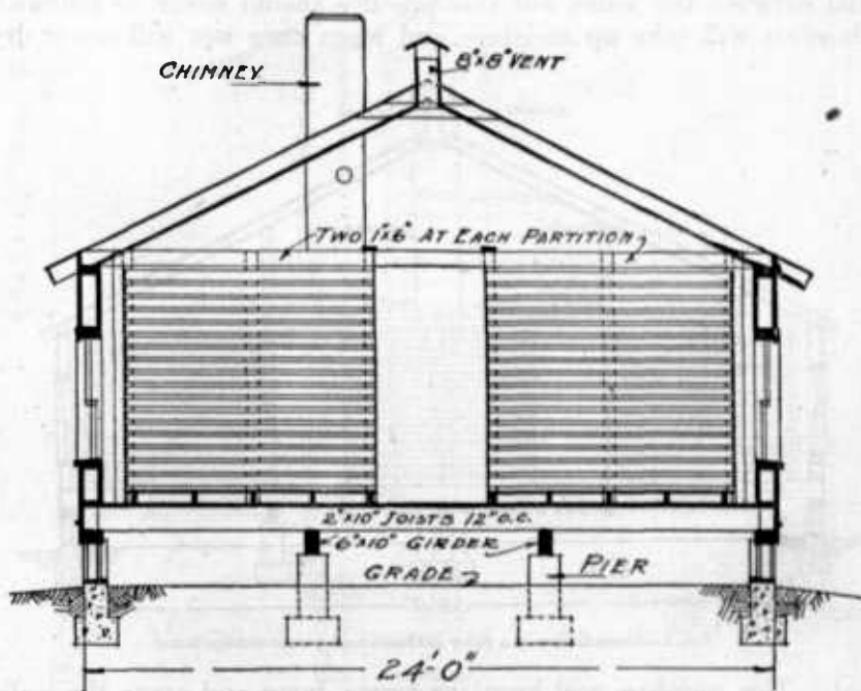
Cross section of a 24 by 60 foot sweet-potato storage house.
